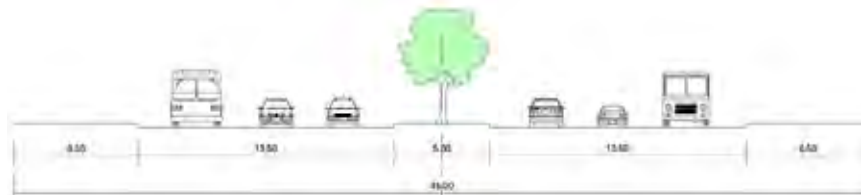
Existing and Planned Cross Sections of BR-316
